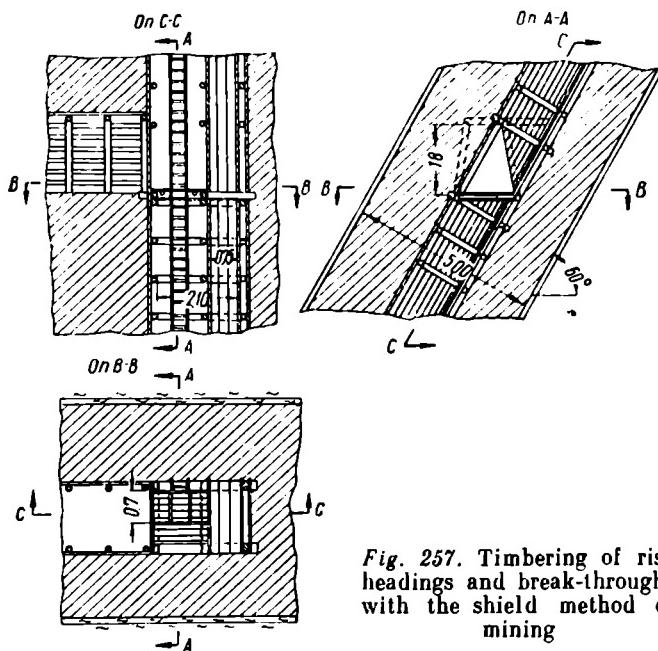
Timbering of rise headings and break-throughs with the shield method of mining
